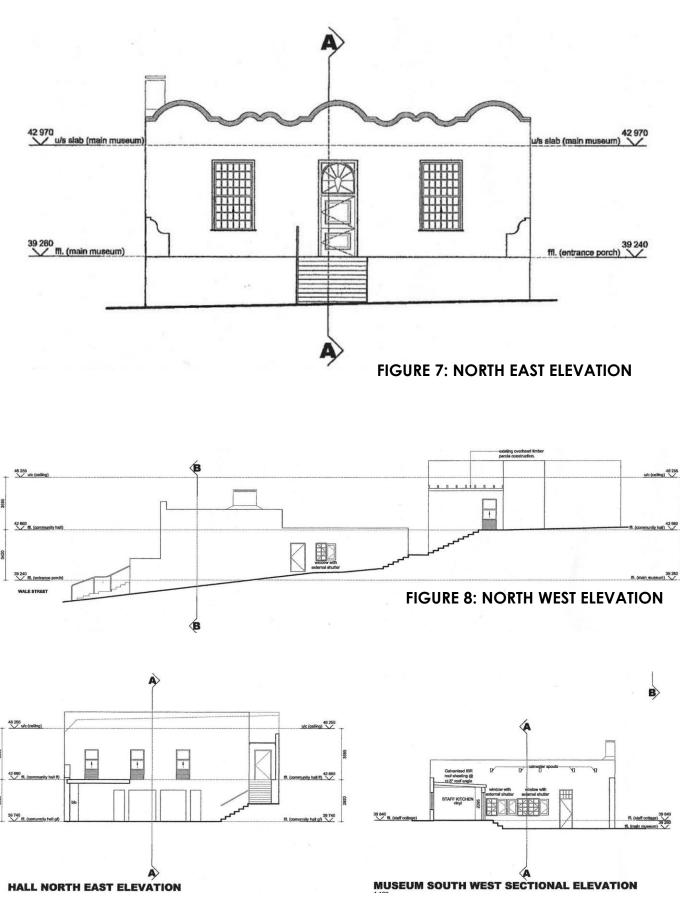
NORTH EAST AND SOUTH WEST SECTIONAL ELEVATIONS
